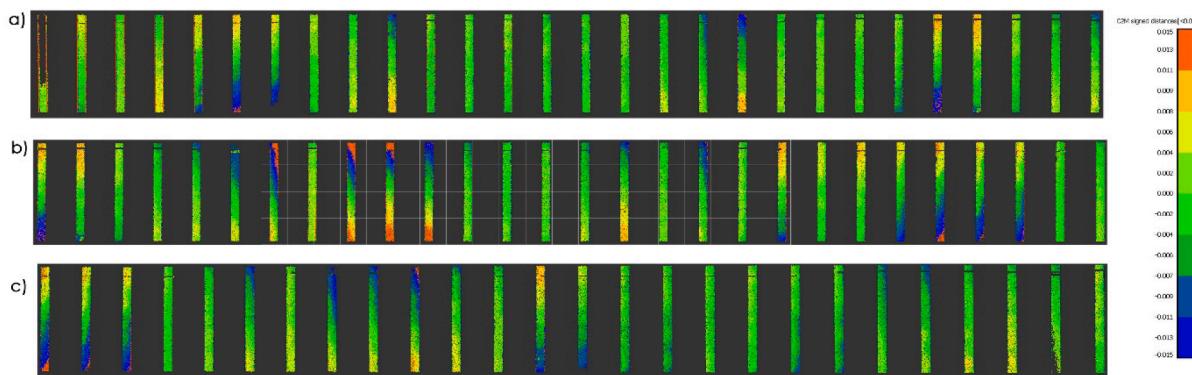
Deformation analysis of floor beams, a) section from A1 station side, b)middle section, c)section from KTS side, right deformation legend.
